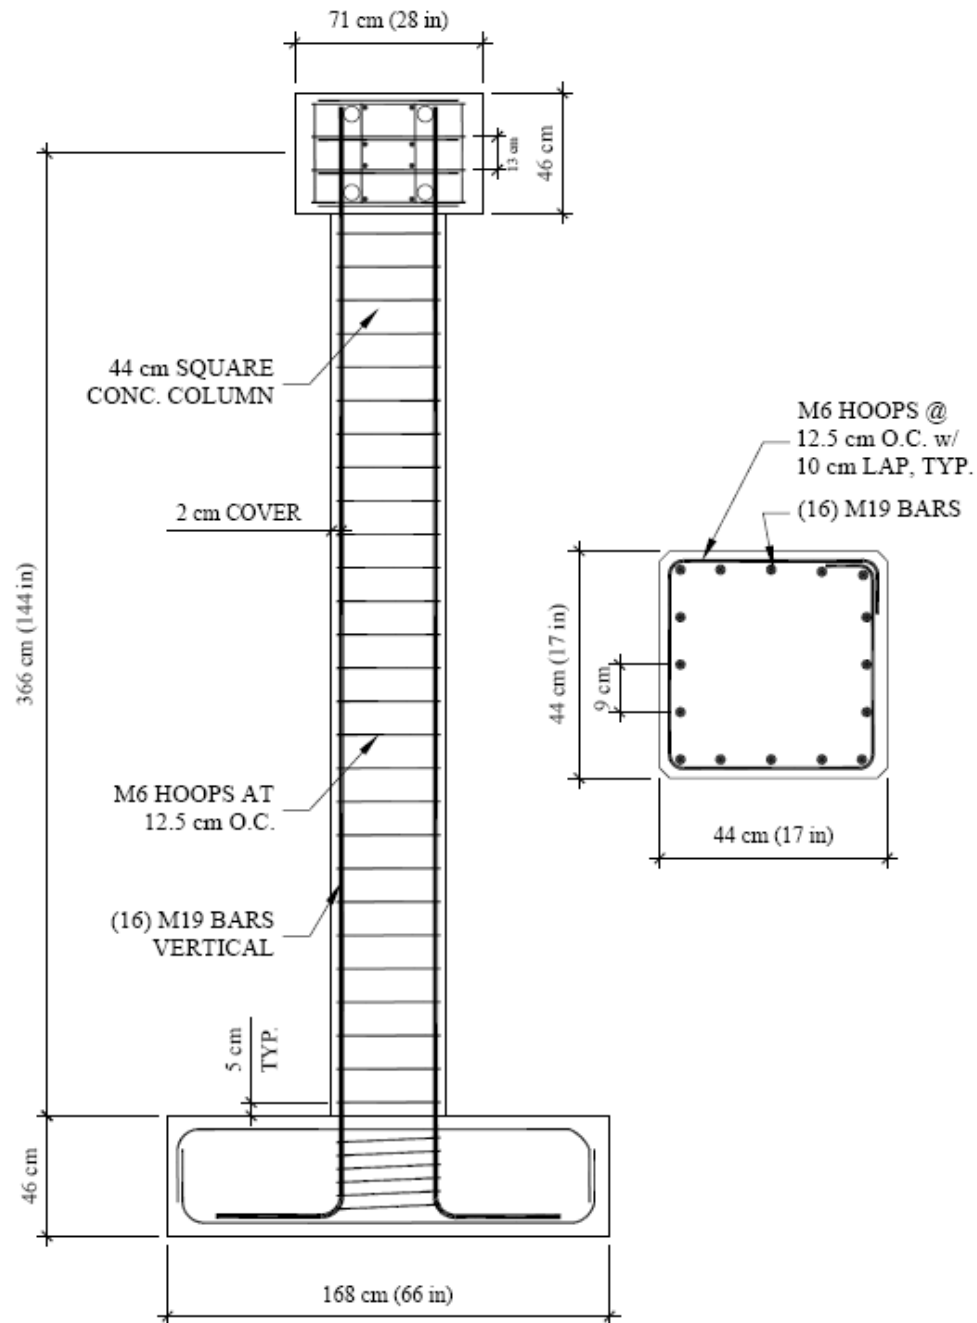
Details of the Square Continuously Reinforced Flexure Column Test Specimen
